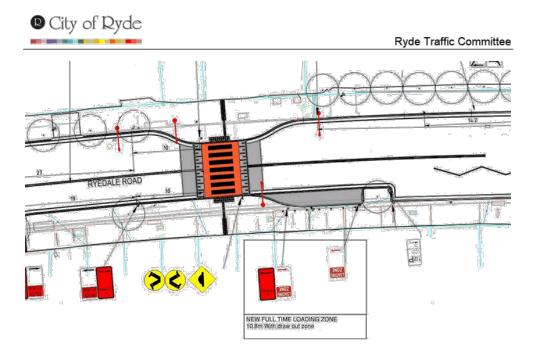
Proposed Loading Zone (full time) – Ryedale Road.
